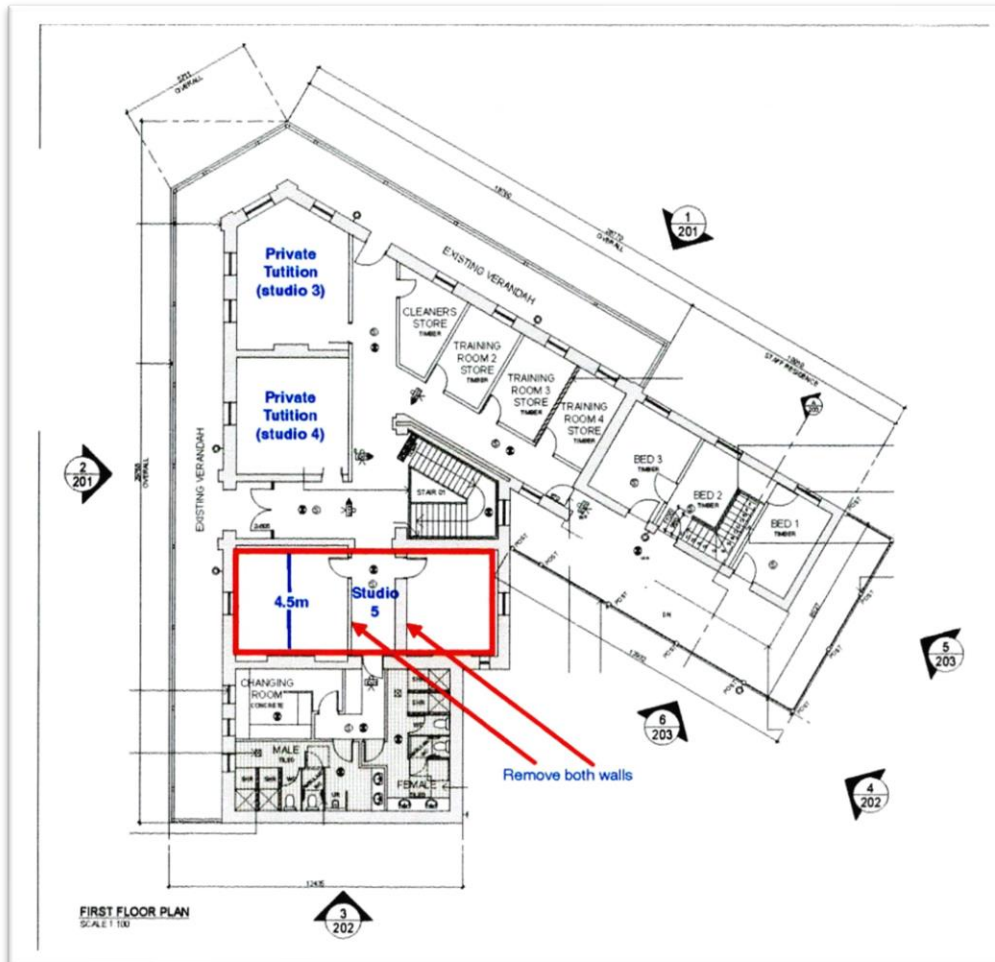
Development Application DA24/0703 – Marked-up Floor Plan
